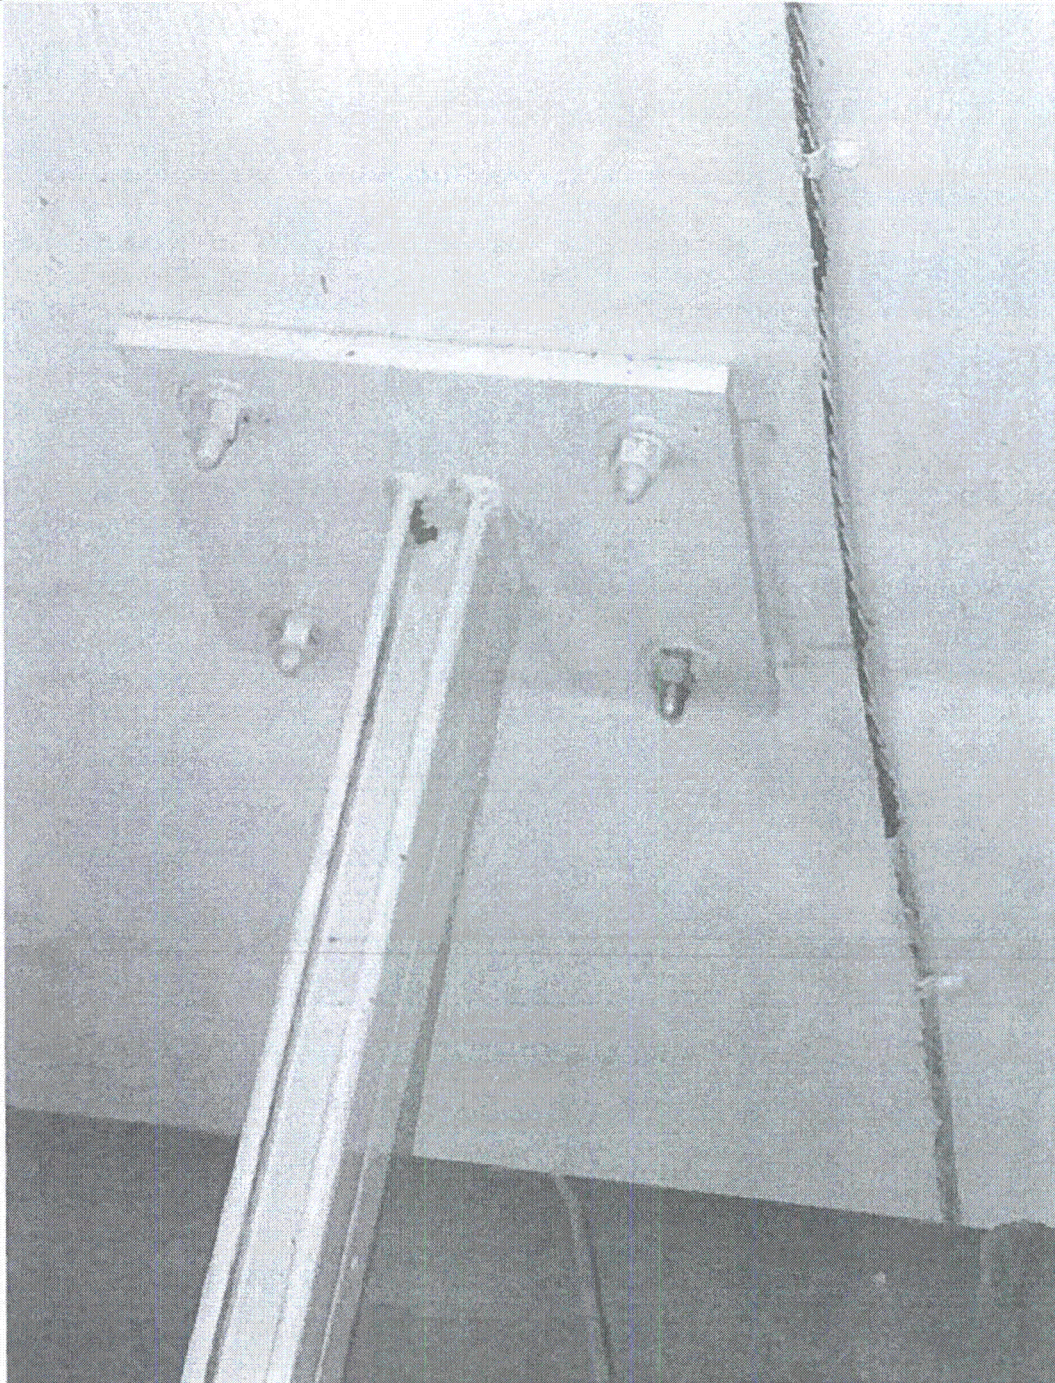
Surface Crack at Conduit Support on Wall (Unit 2 Control TD-T13)
